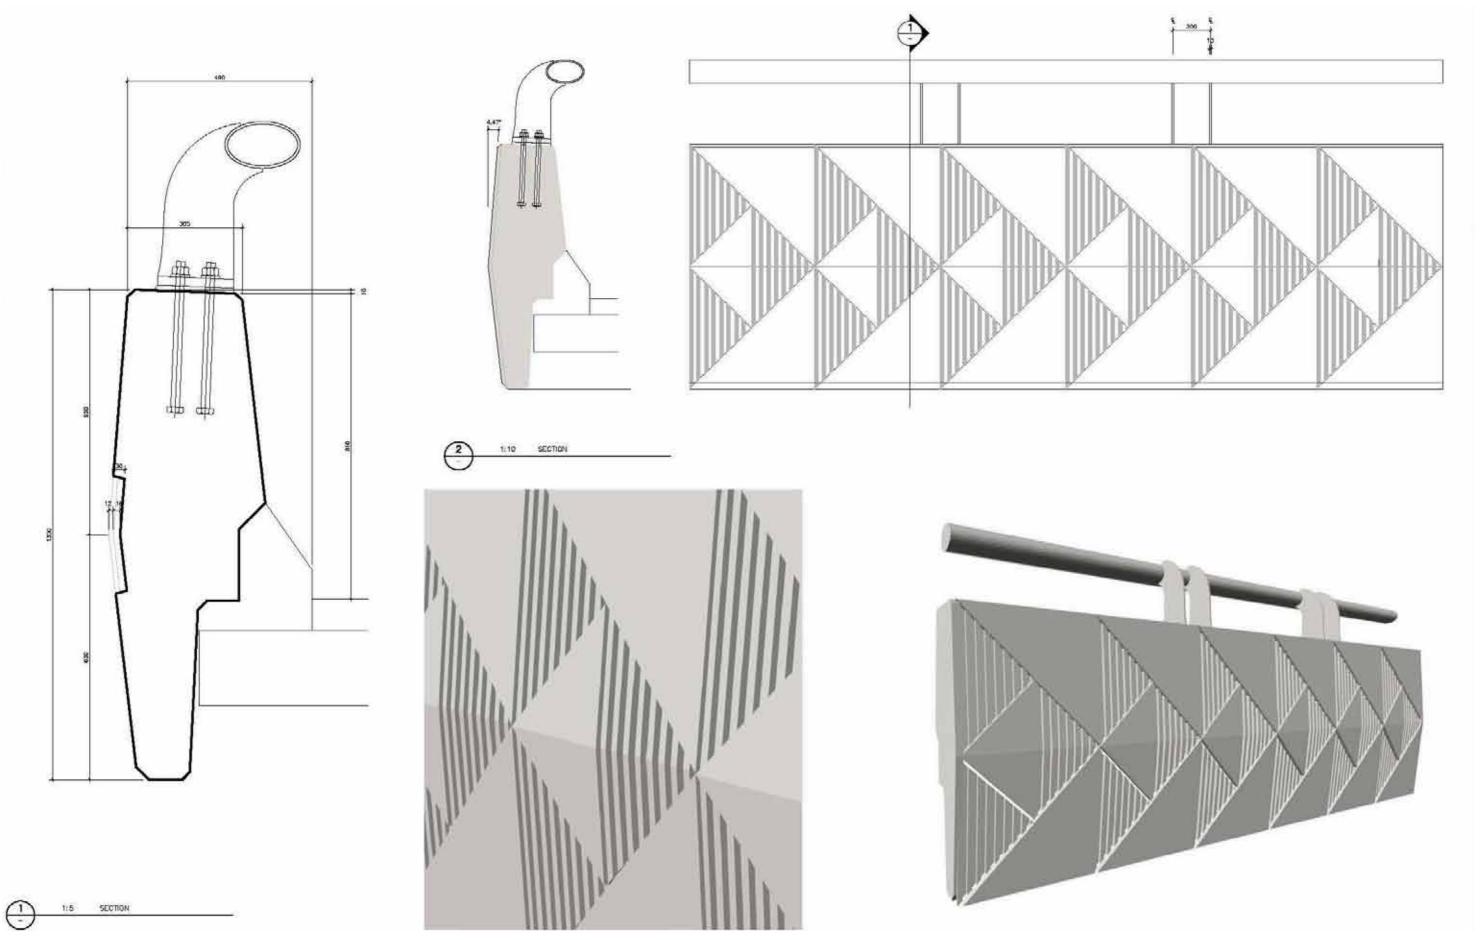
Redoubt Road Flyover detail of barrier and hand rail.
